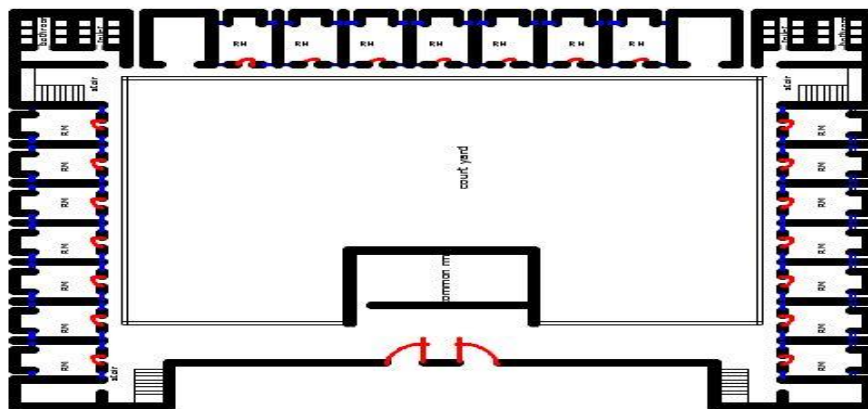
Ground Floor Plan of Male Hostel F.U.T Minna Gidan Kwano Campus.
